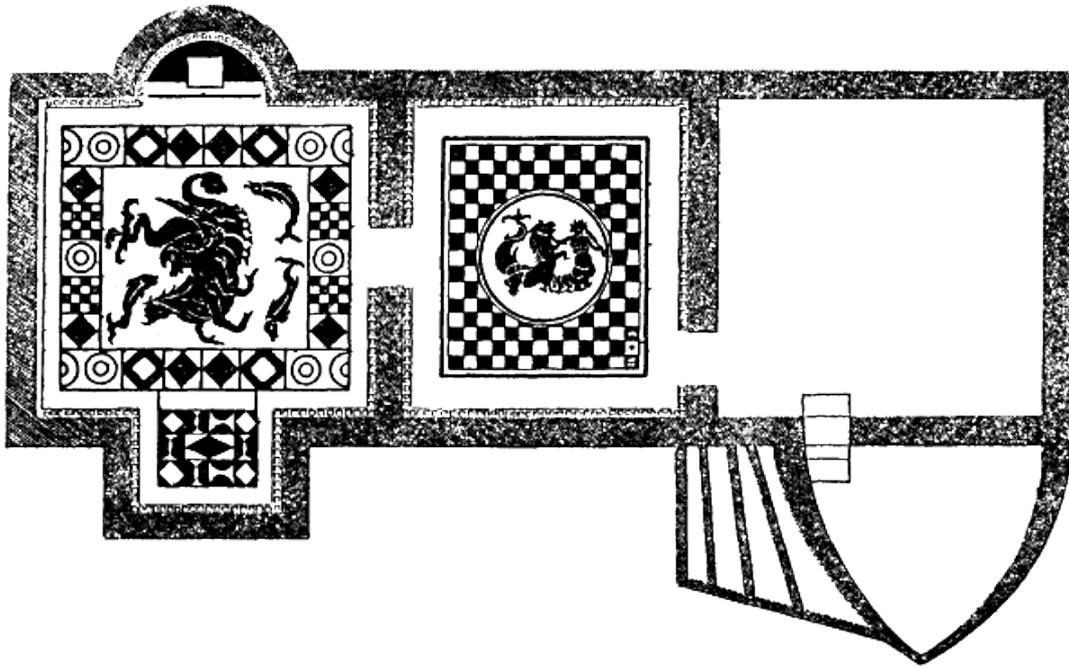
PLAN OF THE BATH BUILDING IN LIPARI
